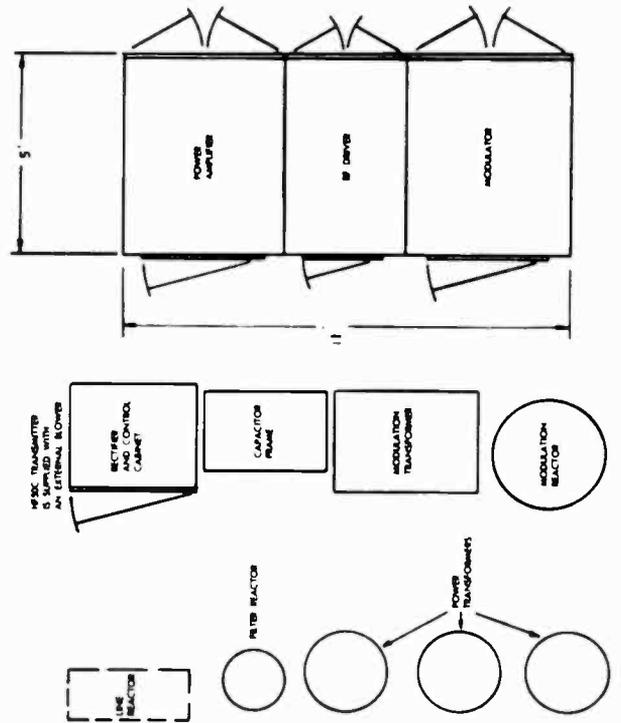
Transmitter building floor plan for a 50-KW AM station.
